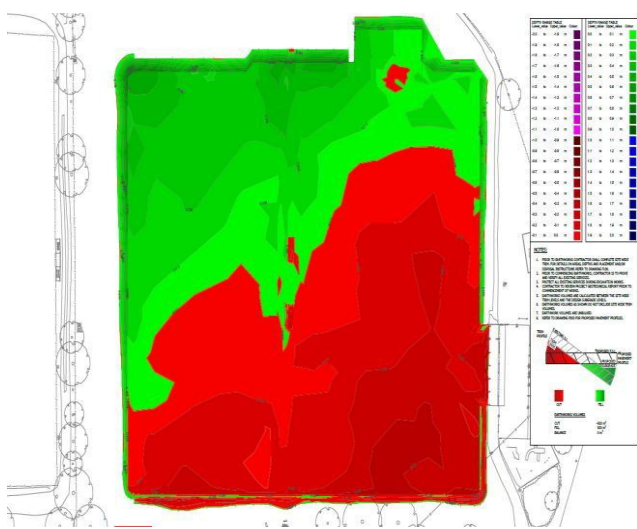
Typical Example of Cut and Fill Modelling from a 3D Site Survey (Source: SPORTENG)
